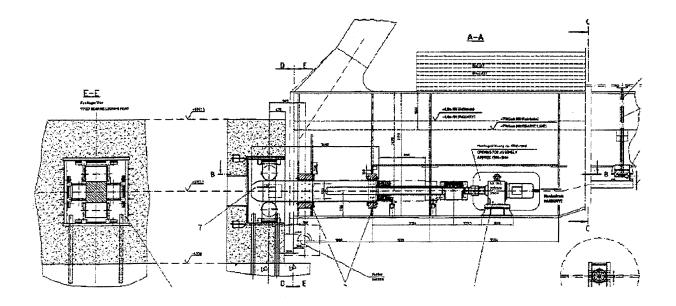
Detail of Bridge Centre Locking (Ref. 7)
